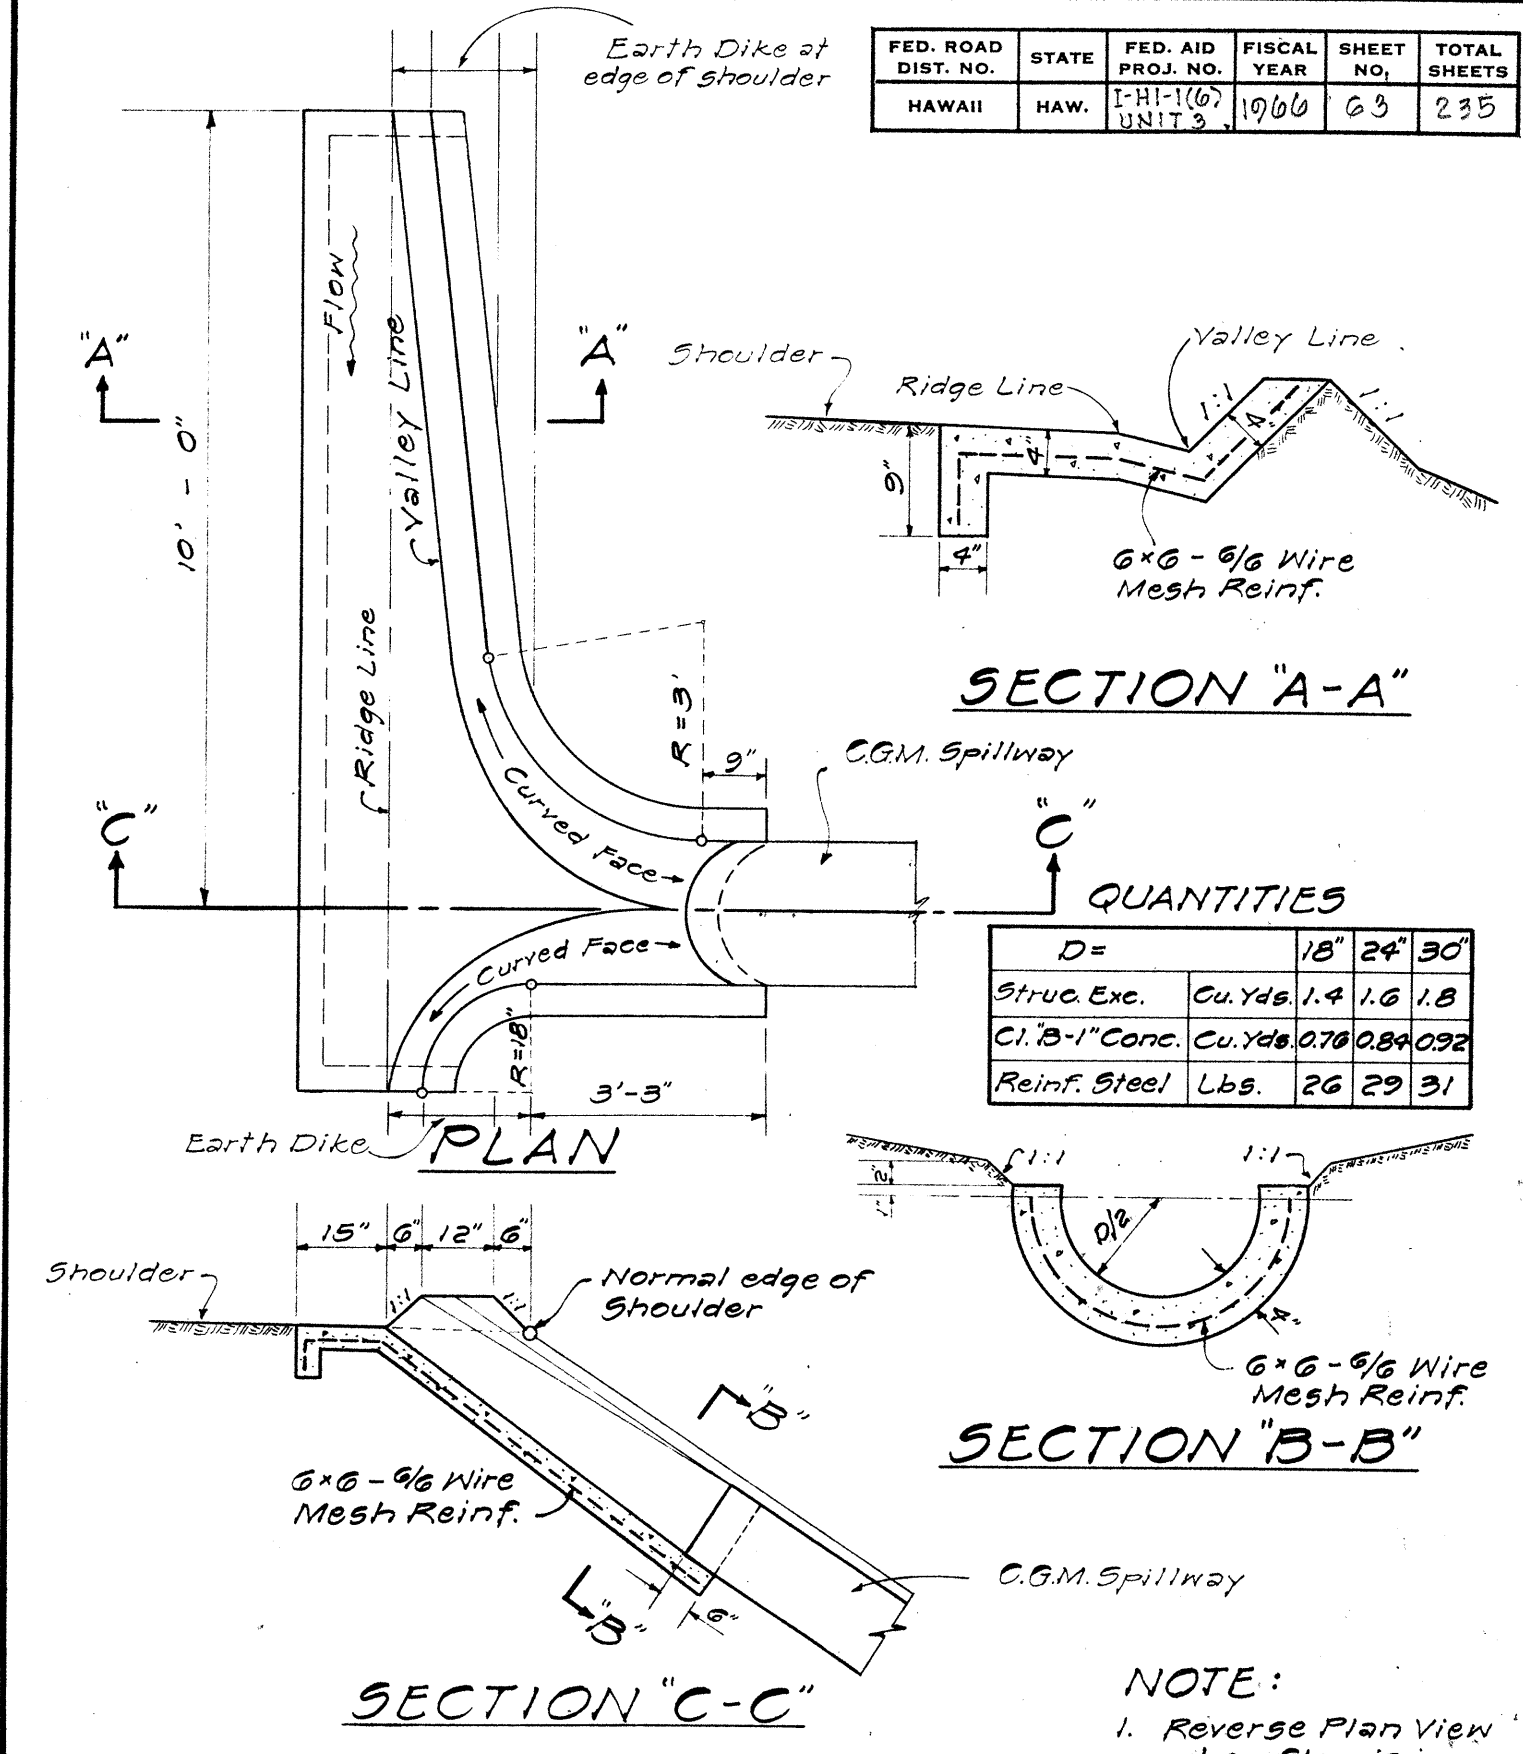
DETAIL OF CULVERT TO SPILLWAY "Y" CONNECTION
